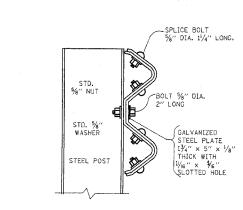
DETAIL OF GUARDRAIL SUPPORT AND END ANCHORAGE
